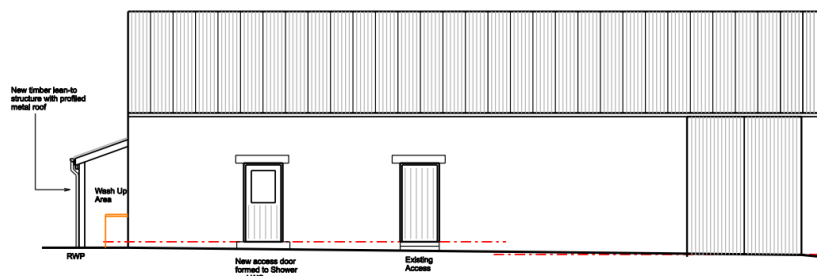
Extract from the proposed east elevation of the barn (part elevation) showing the existing and new door and wash up area with lean-to cover.
